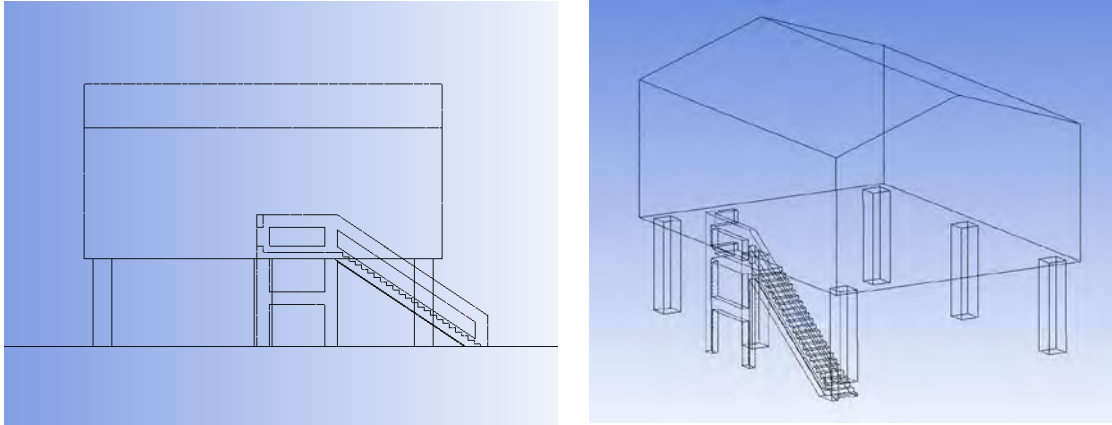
Gable roof house drawing elevated by 7 ft with stairs
